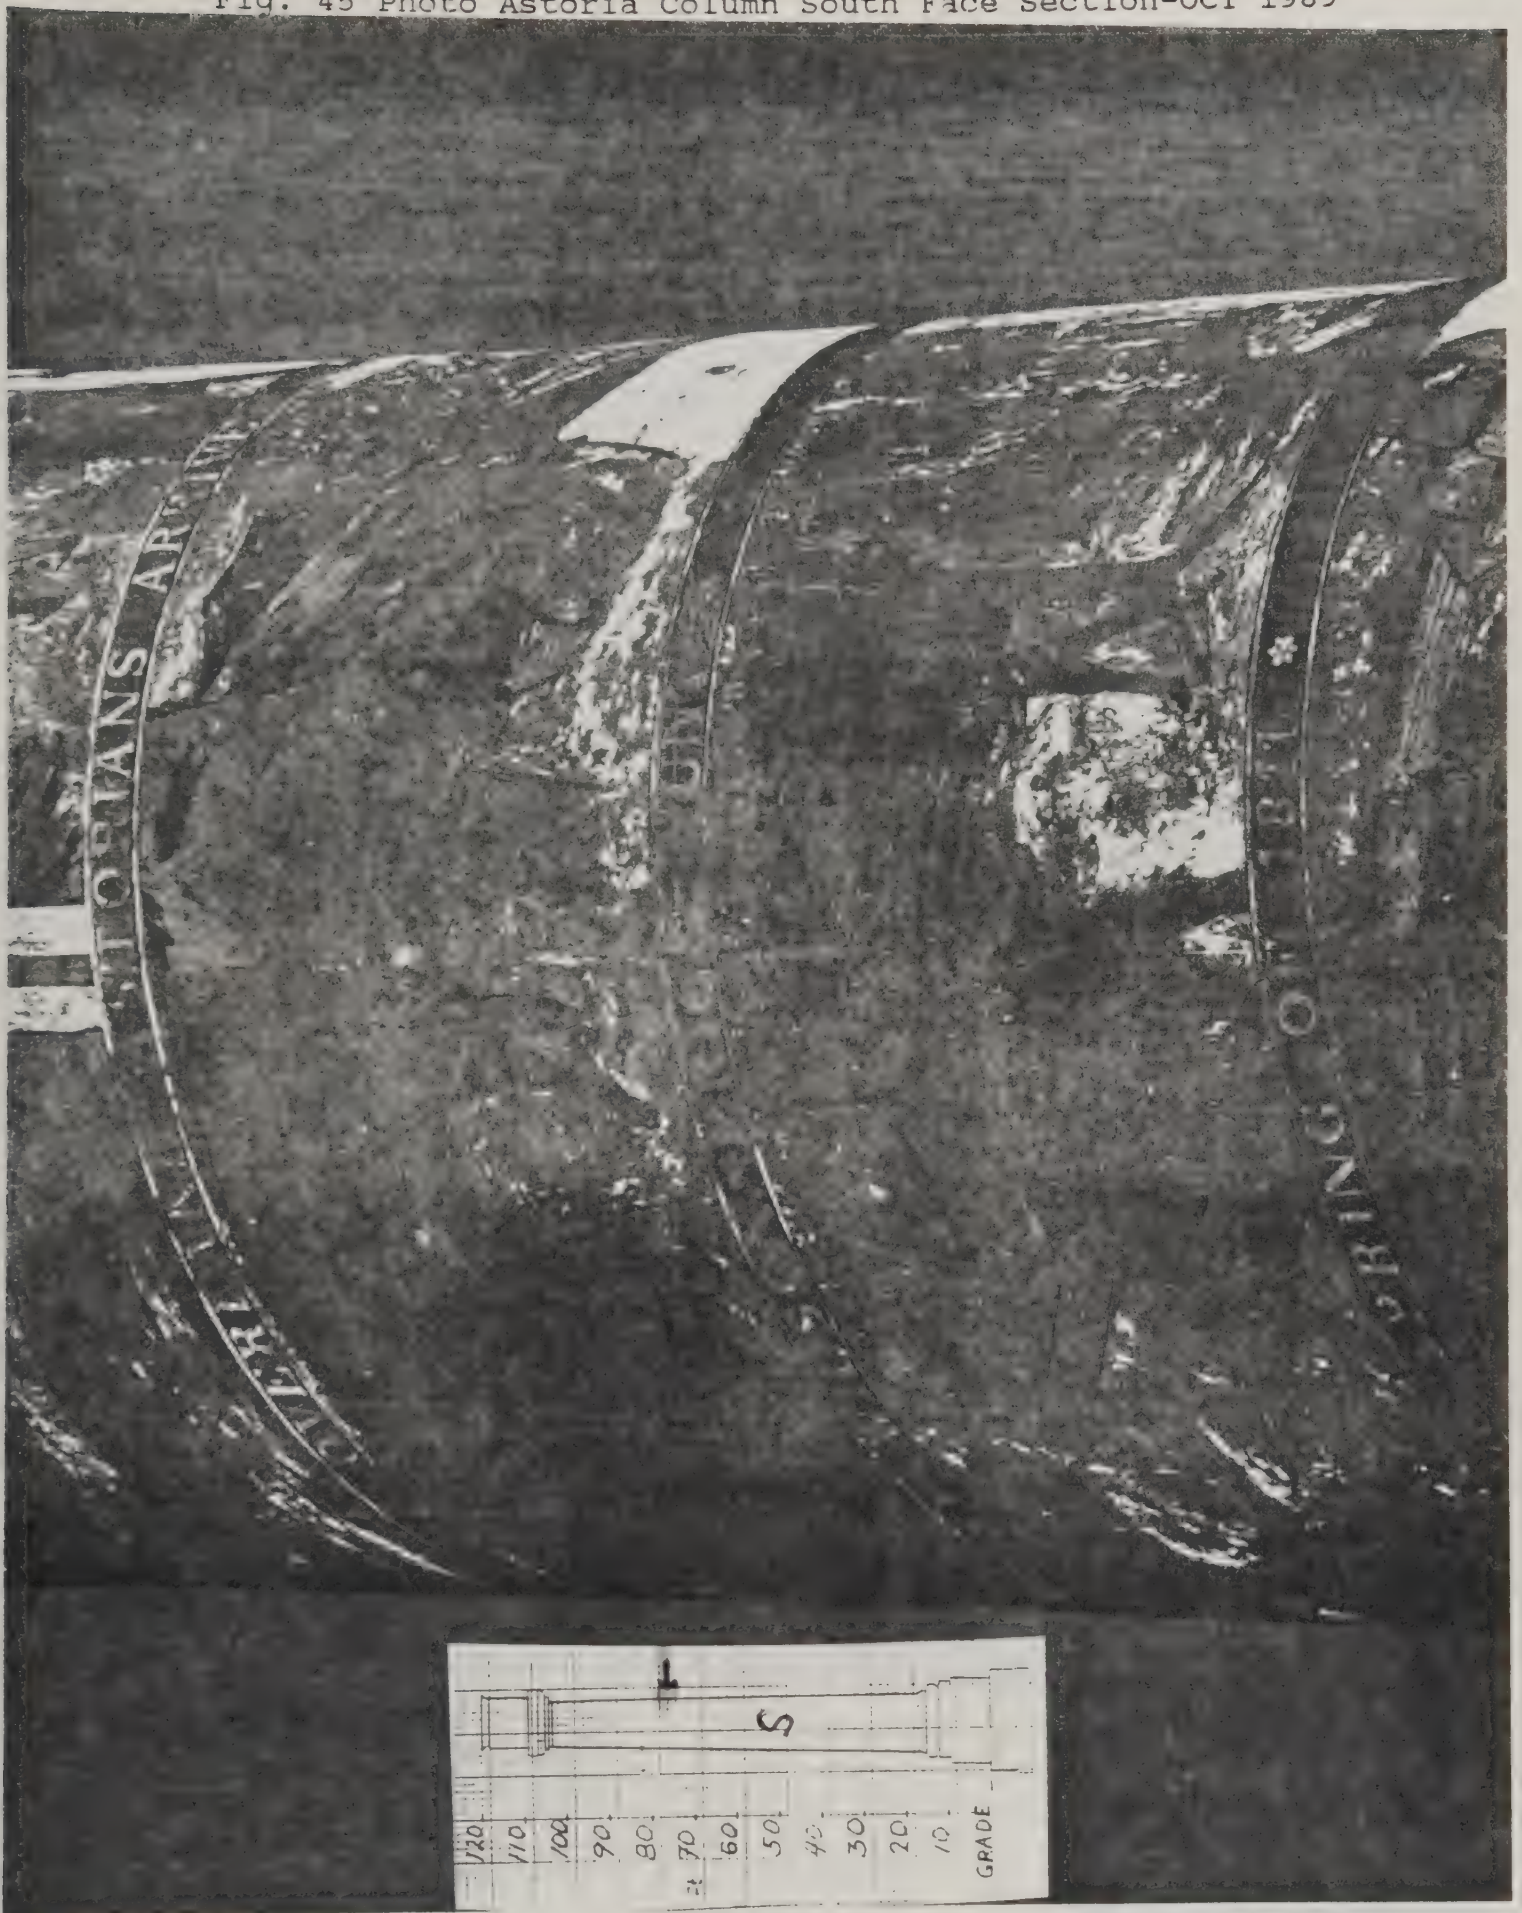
Photo Astoria Column South Face Section-OCT 1989
